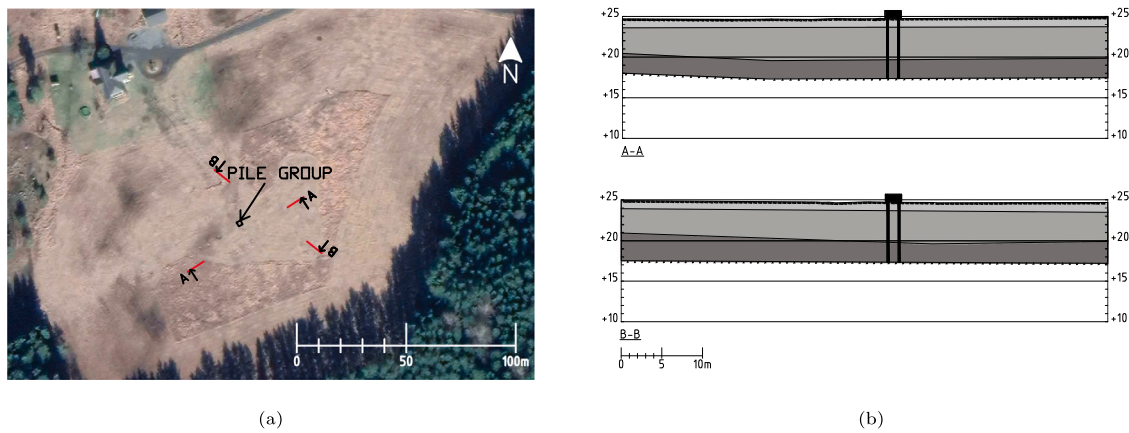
Overview of the site with (a) an aerial photography [43] with the location of the pile group indicated and (b) two sections with the stratification interpreted from geotechnical site investigations with a layering of dry crust clay (light gray), saturated soft clay (medium gray) and till (dark gray) on top of a stiff bedrock.
